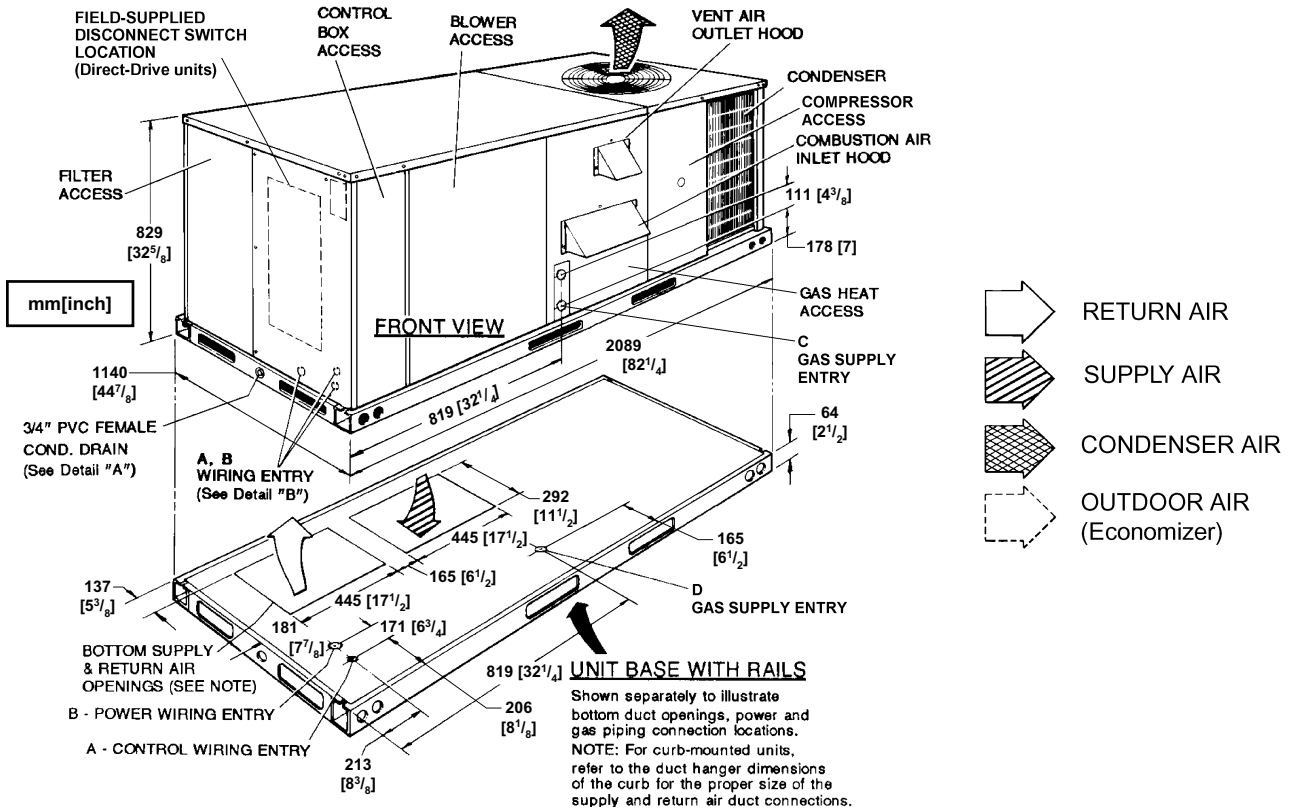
UNIT DIMENSIONS (3 - 6 TON COOLING/GAS HEAT) FRONT VIEW
